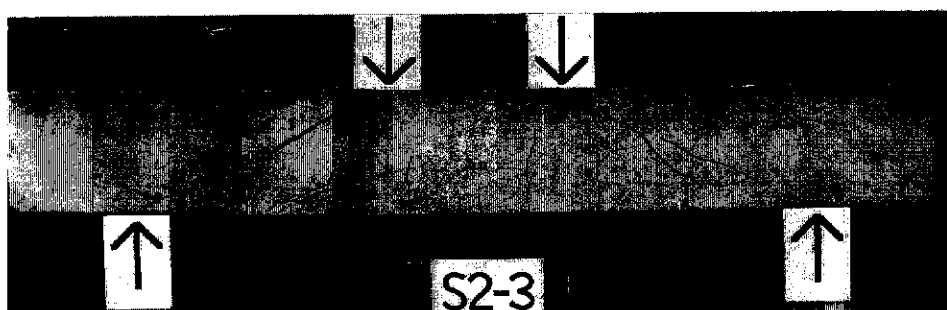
Crack Pattern of the Back Face of Beam S2-3
